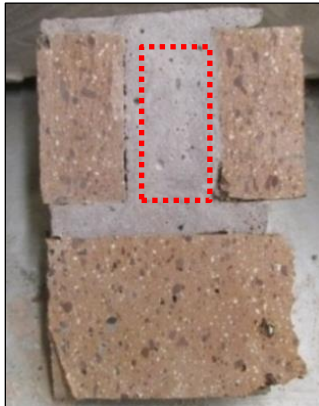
Cross-sectional cut of brick removed from wall panel, displaying fully filled void spaces
